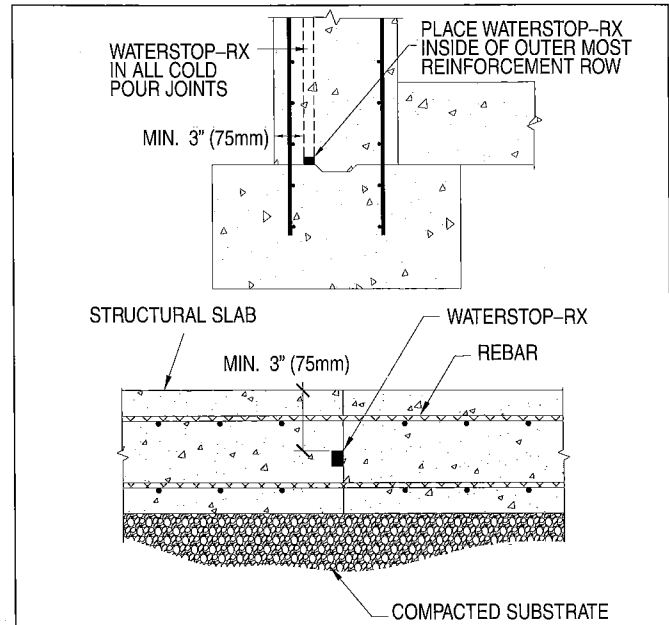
Placement of Waterstop-RX 101 & 101T at typical construction joints with required 3" (75mm) concrete coverage.
